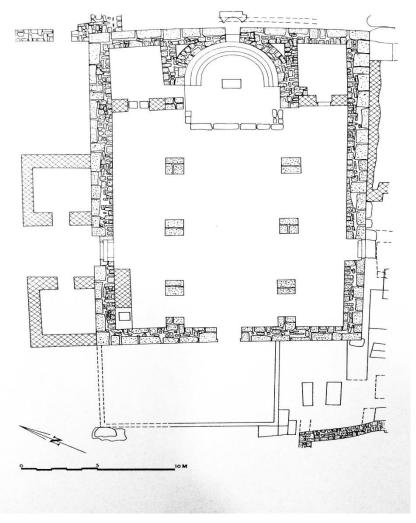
Plan of the Monastery Church of St. Barlaam (Djobadze, 1986: plan d)
